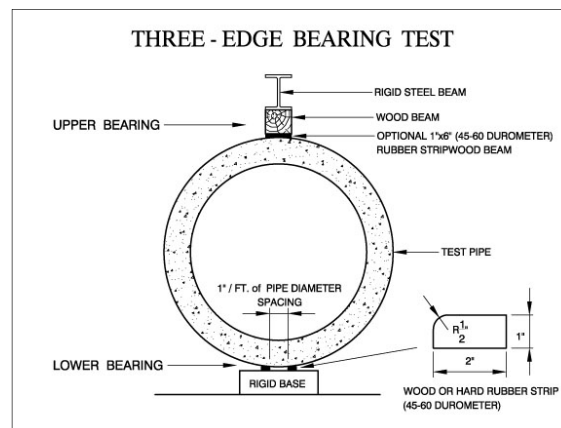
Illustration of the setup for a three-edge bearing test.
